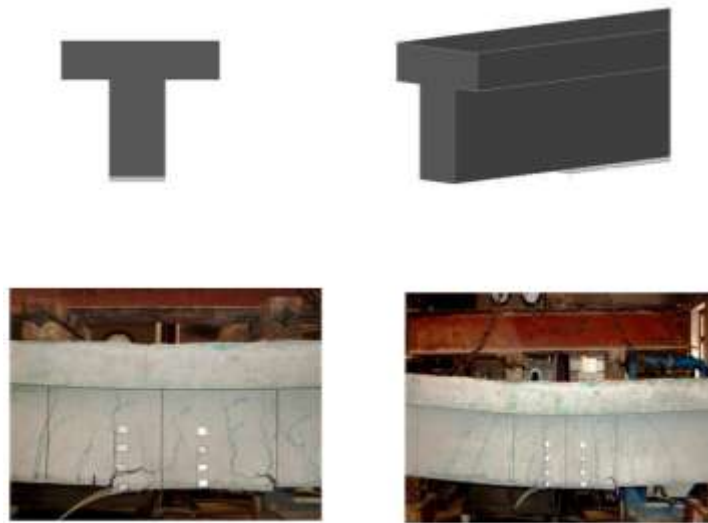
Debonding of fibre and Cracks in beam 2
